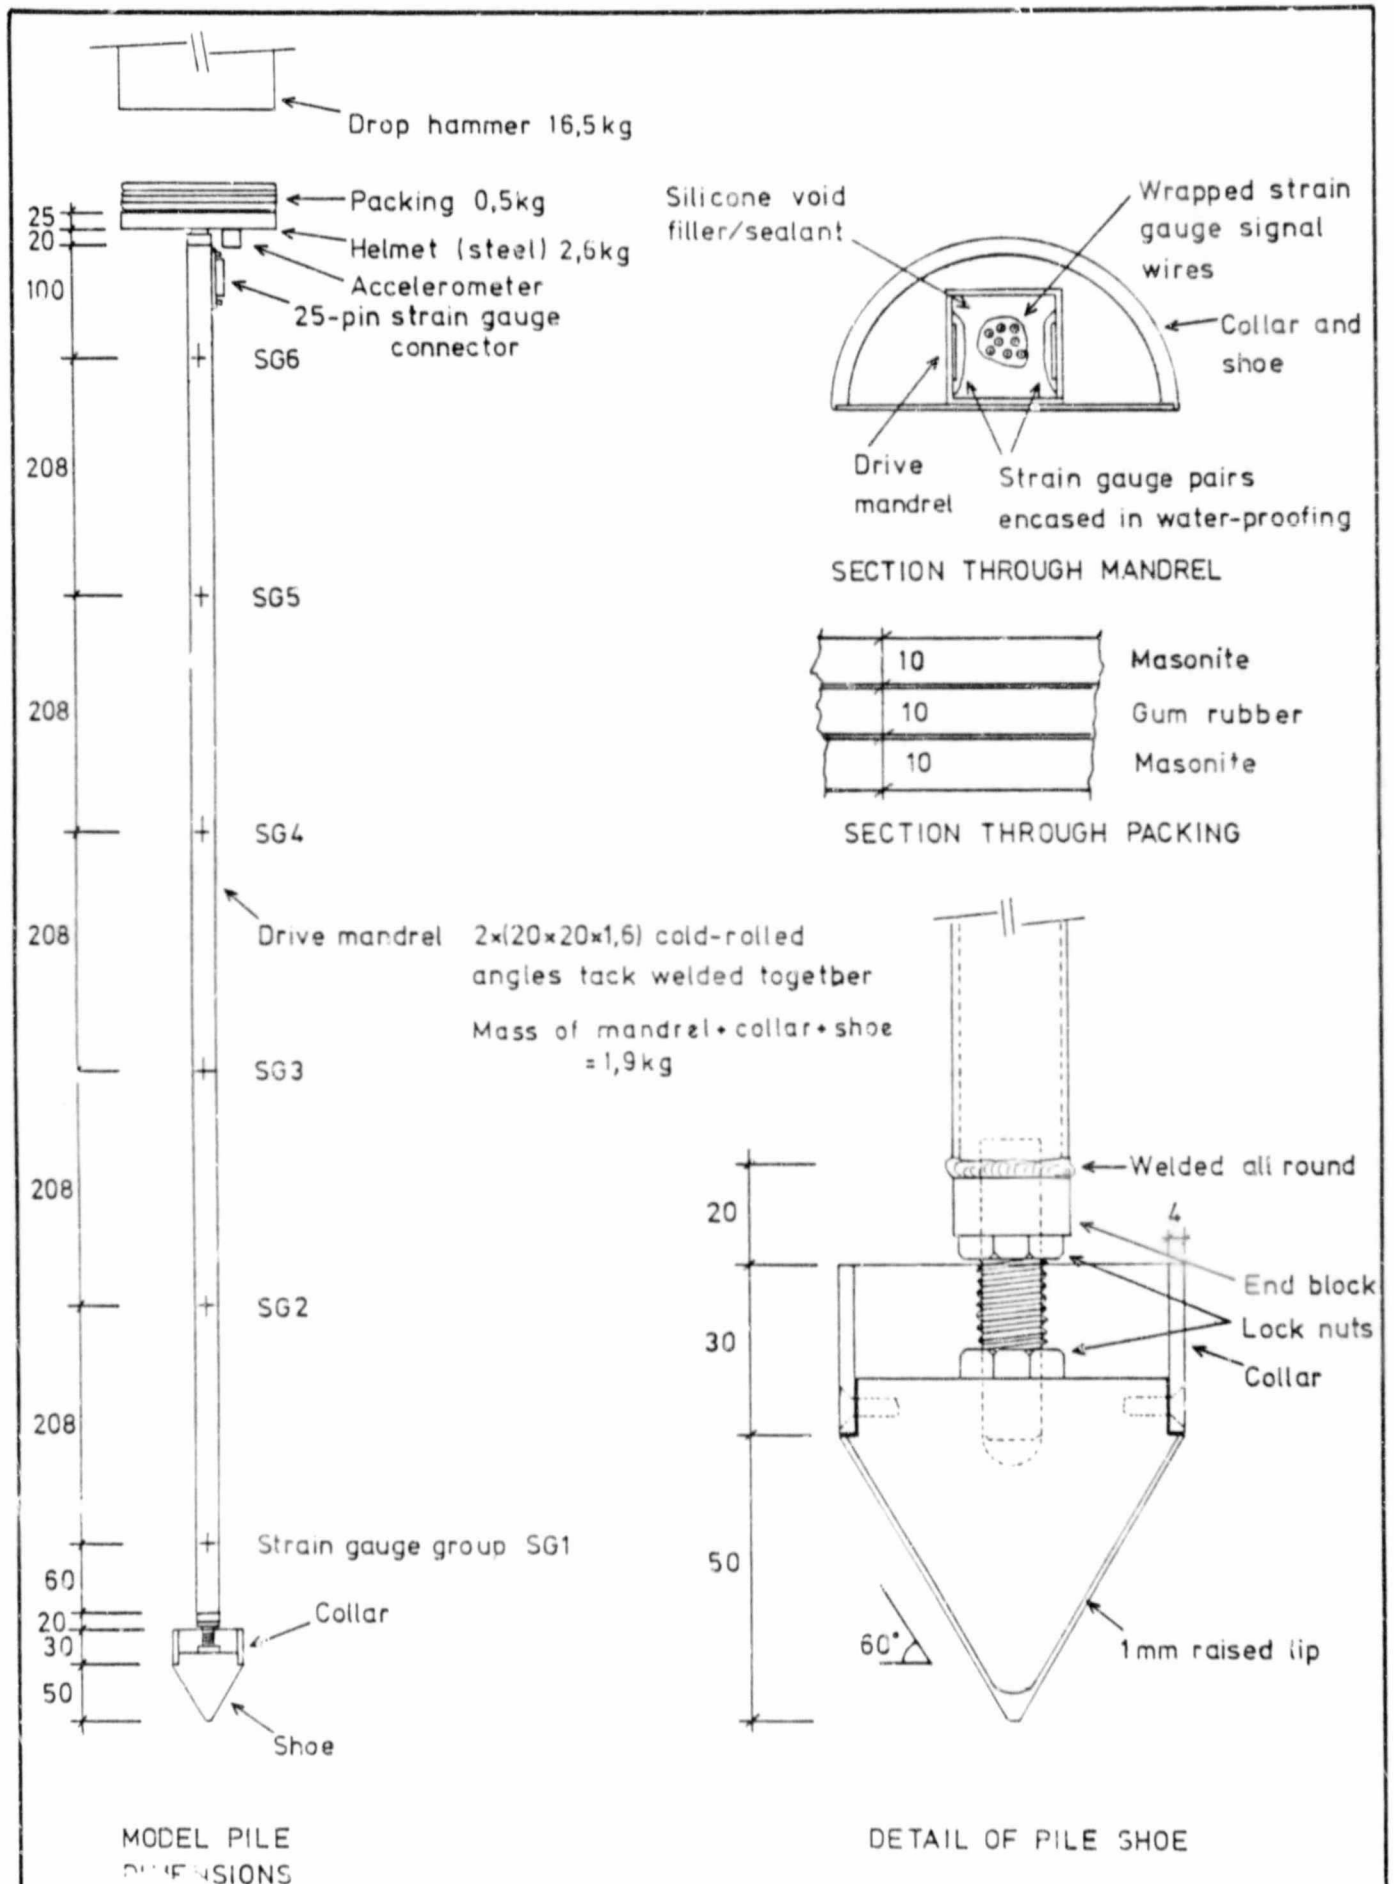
Details of the model pile - mandrel and shoe
